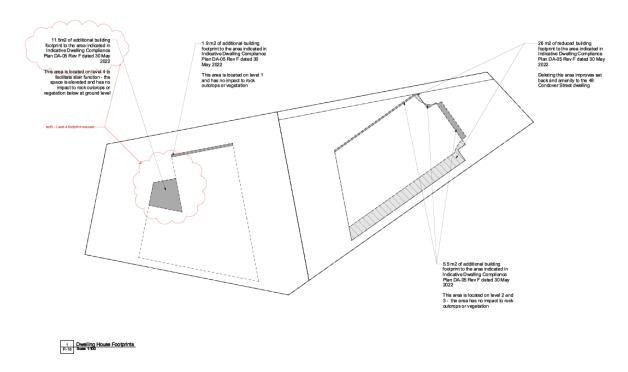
excerpt of the proposed dwelling footprints - plan P-18
